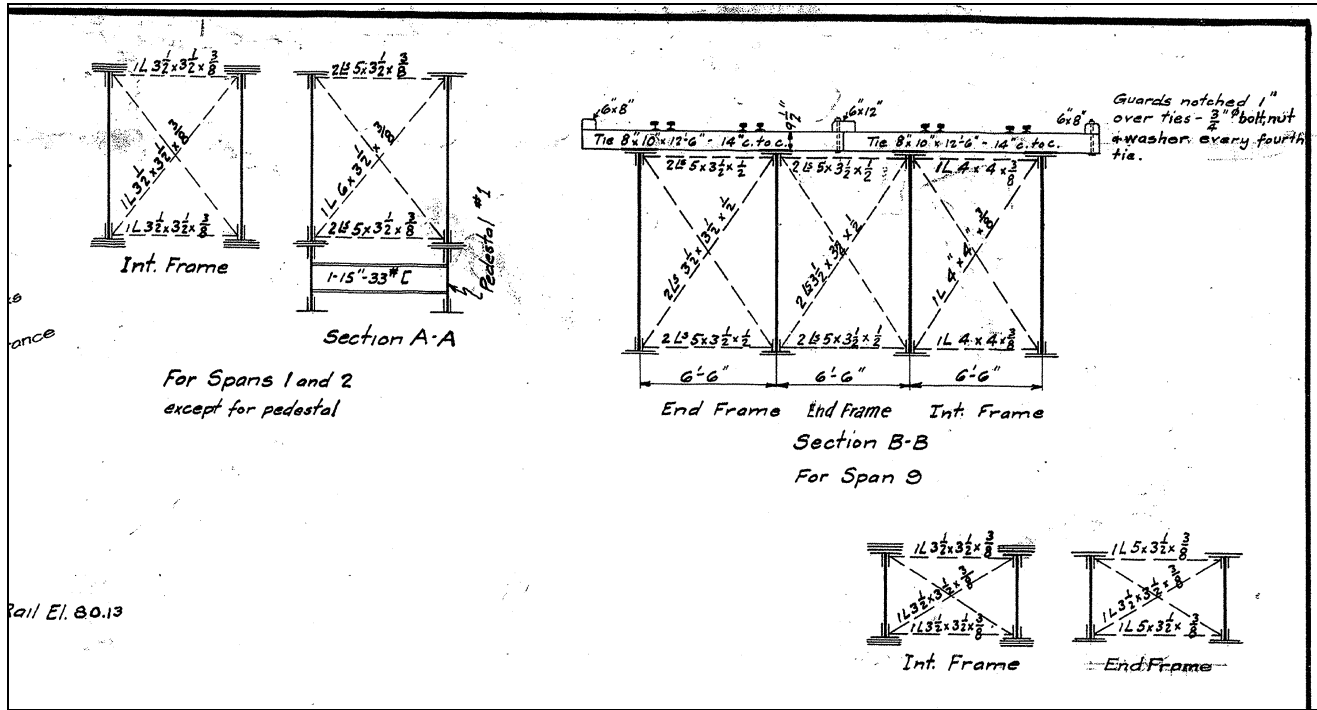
Portion of original plan sheet showing sections of girder spans (source: Massachusetts Bay Transportation Authority files).
